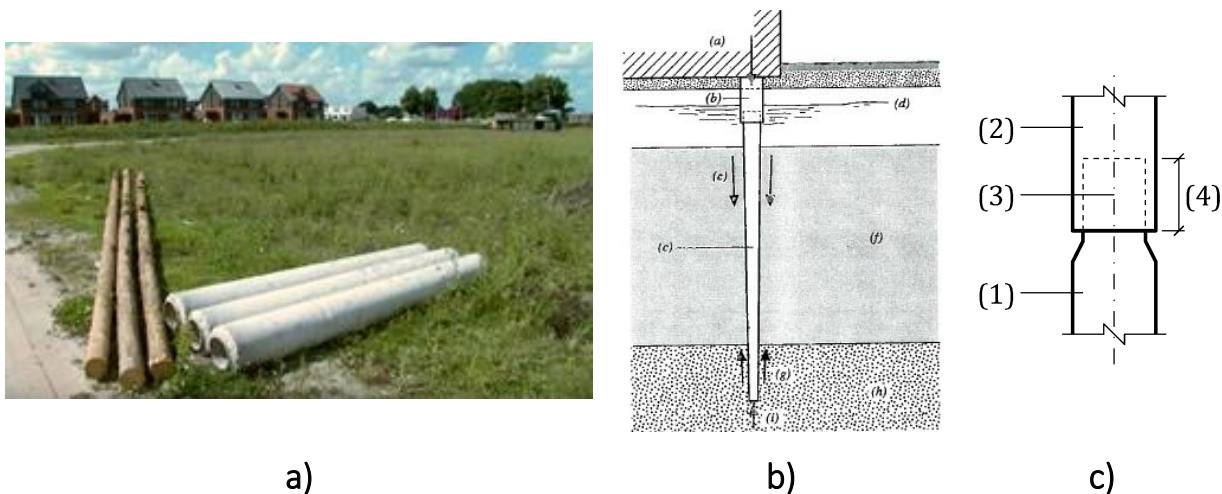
a): Timber piles and concrete extension piles. b): Timber pile with concrete extension pile (b) on top of the timber pile (c). (d) is the ground water level. c): Detail view of the top of the timber pile (1) and the concrete extension pile (2) with a socket (3) of a certain depth (4).
